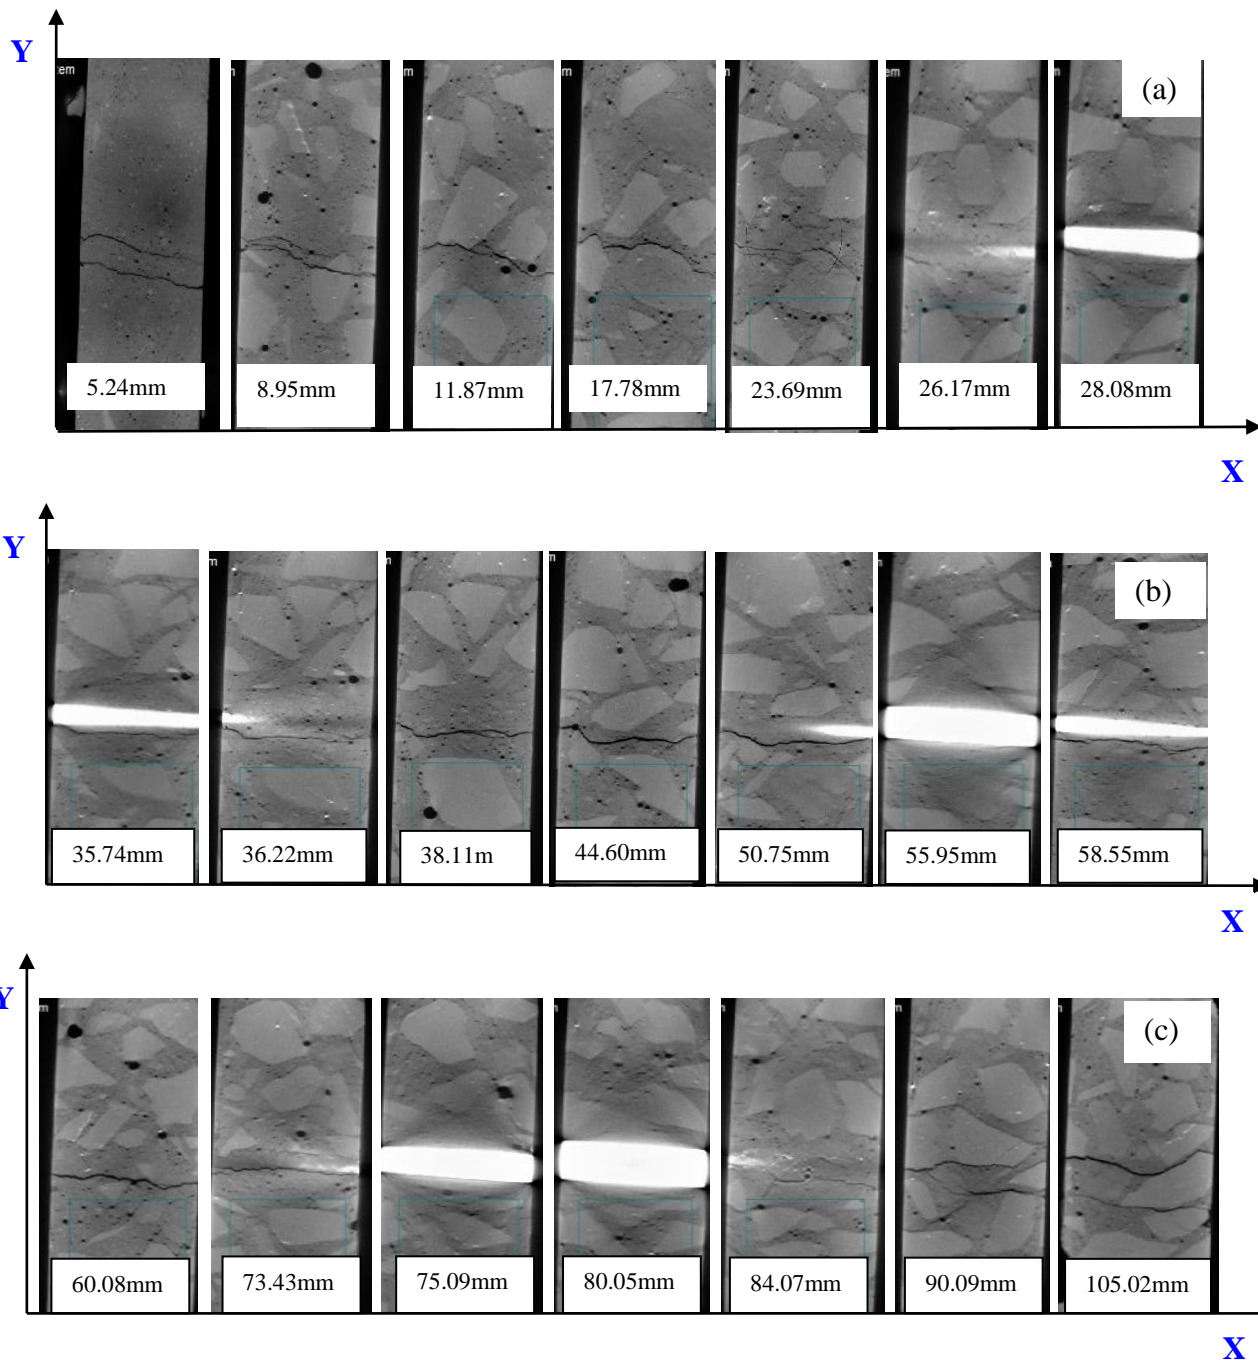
2D images of XY plane of reinforced concrete.(a) from flexural area to tension steel bar,(b) from tension steel bar to stainless bar, (c) from stainless bar to compressive area
